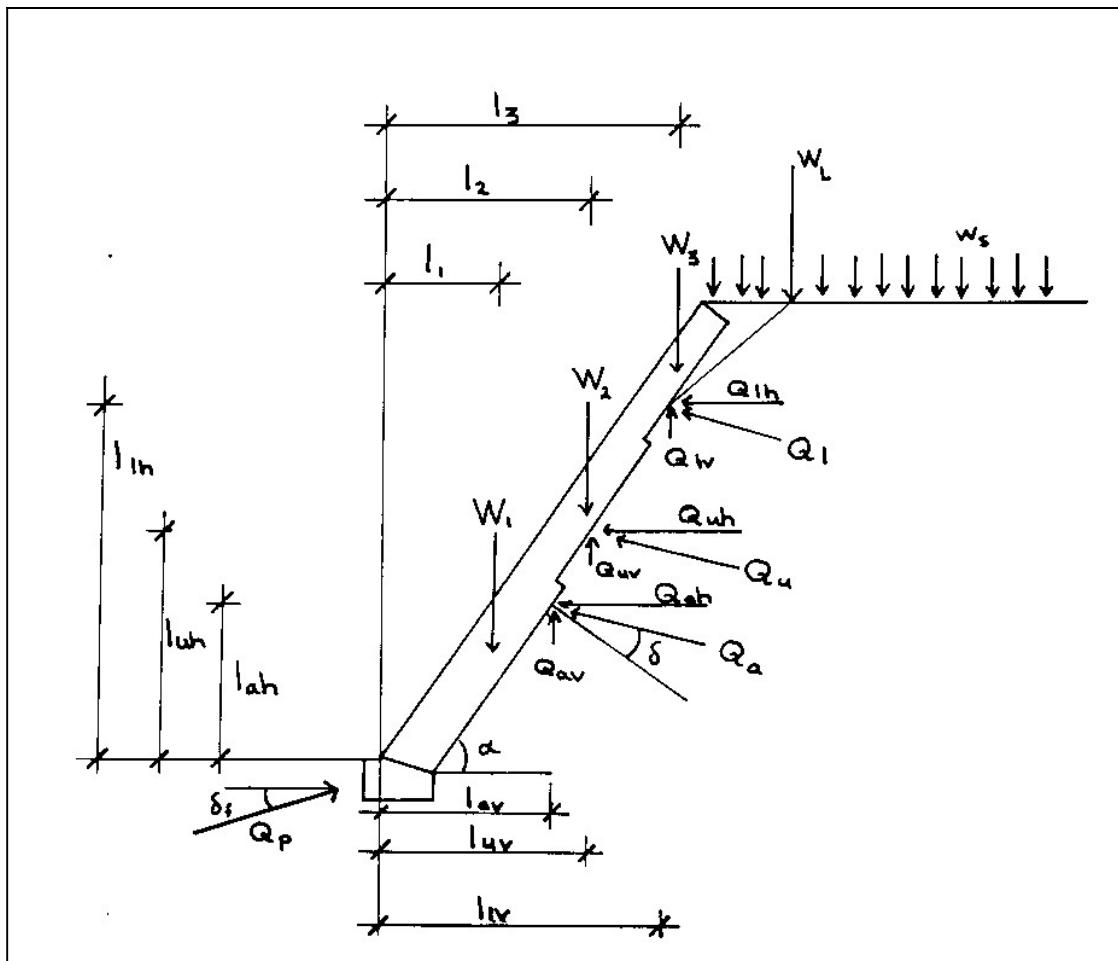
The forces to be considered in analysing a dry stack retaining wall
